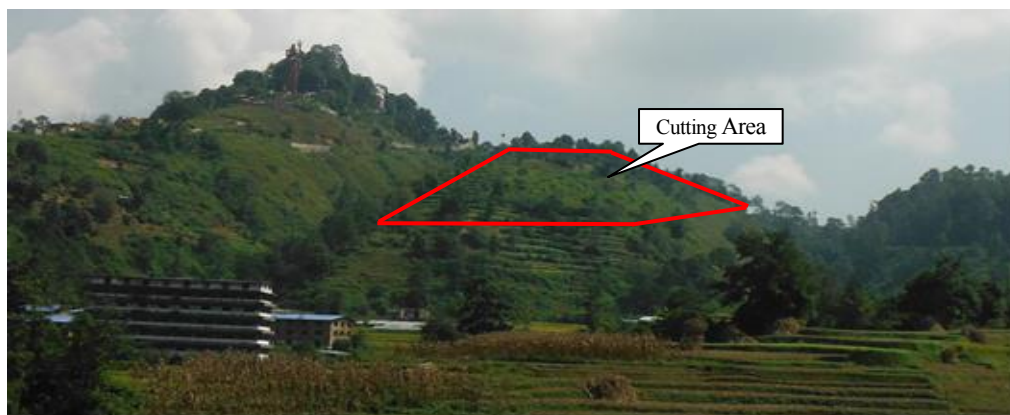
Existing Condition of Proposed Borrow Pit
